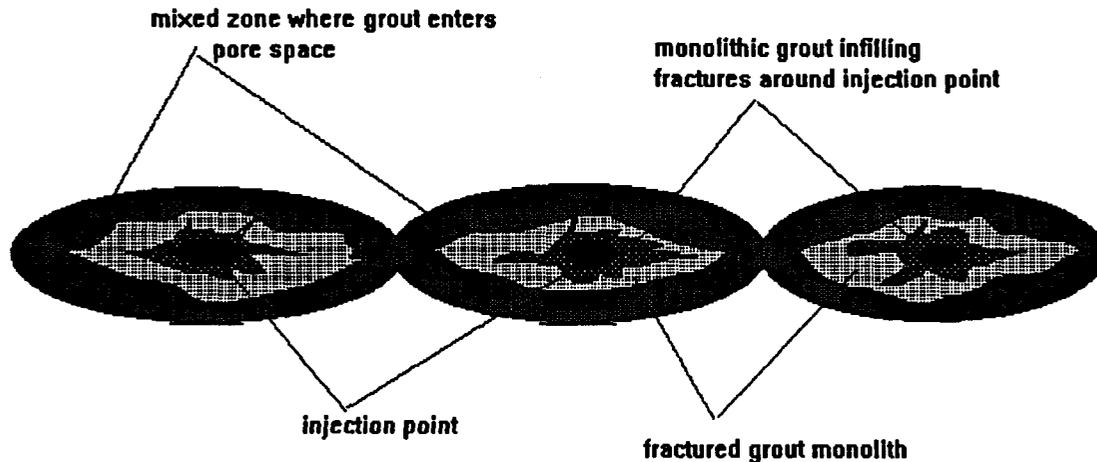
Conceptual Cross-Section of Subsurface Grout Barrier
